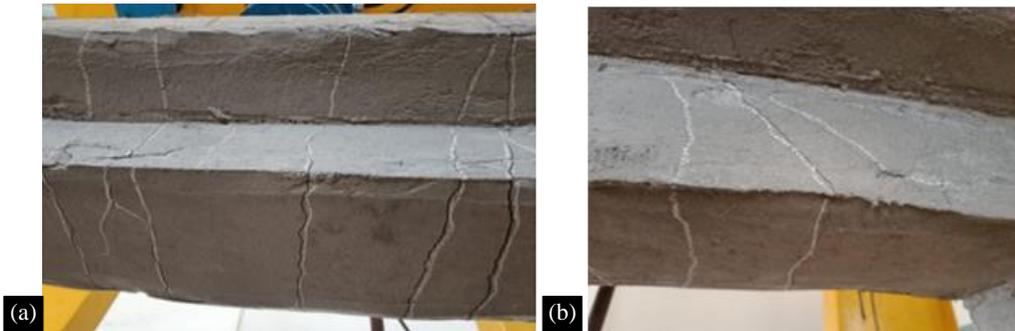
Close-up view of flexure and shear cracks in specimen FRCM-1LF.
